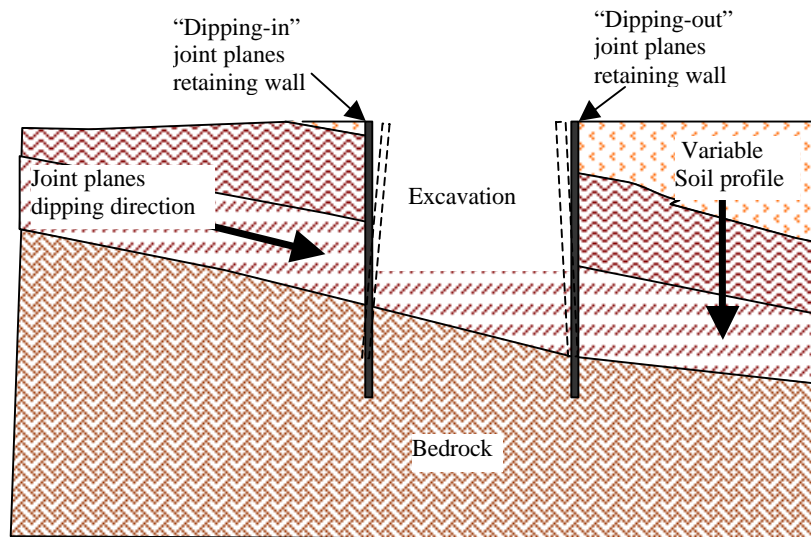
Conceptualization of the joint planes dipping with respect to the field test walls
